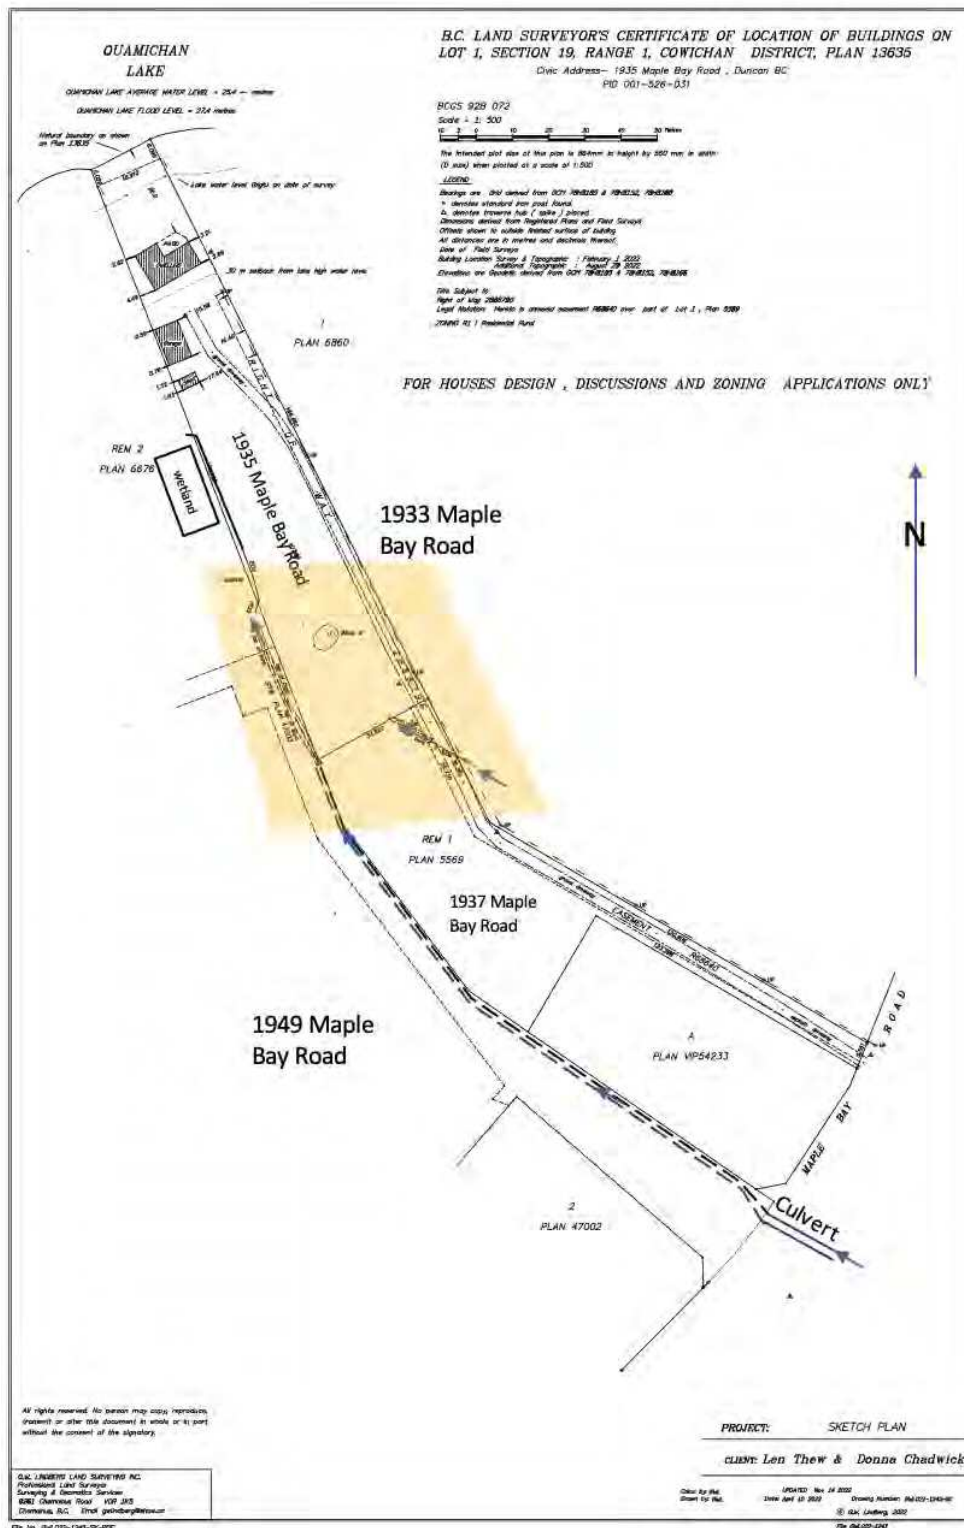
Area wide site plan showing 1935 Maple Bay Road, as well as adjacent properties. The SRW containing the drainage ditch works is shown beginning at the culvert under Maple Bay Road (blue arrows indicate flow direction). The light orange area is shown in greater detail in Figure 10.
